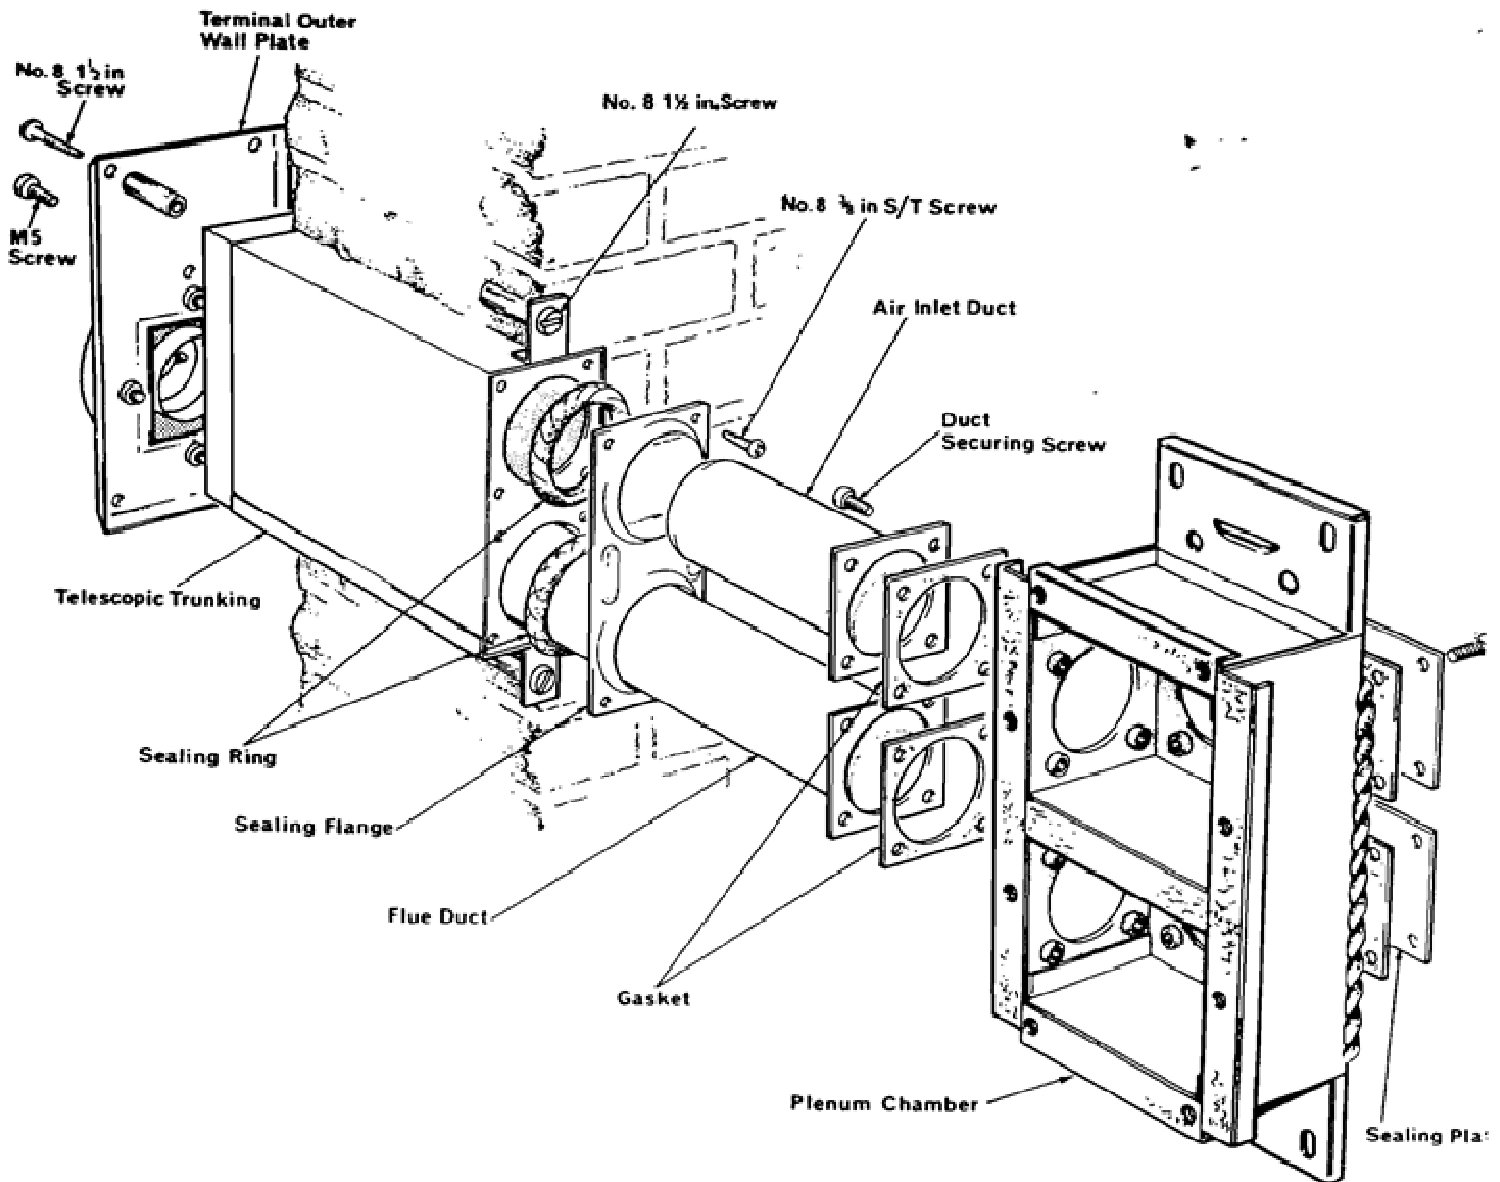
ARRANGEMENT OF NETAHEAT 16/22 DUCTS
